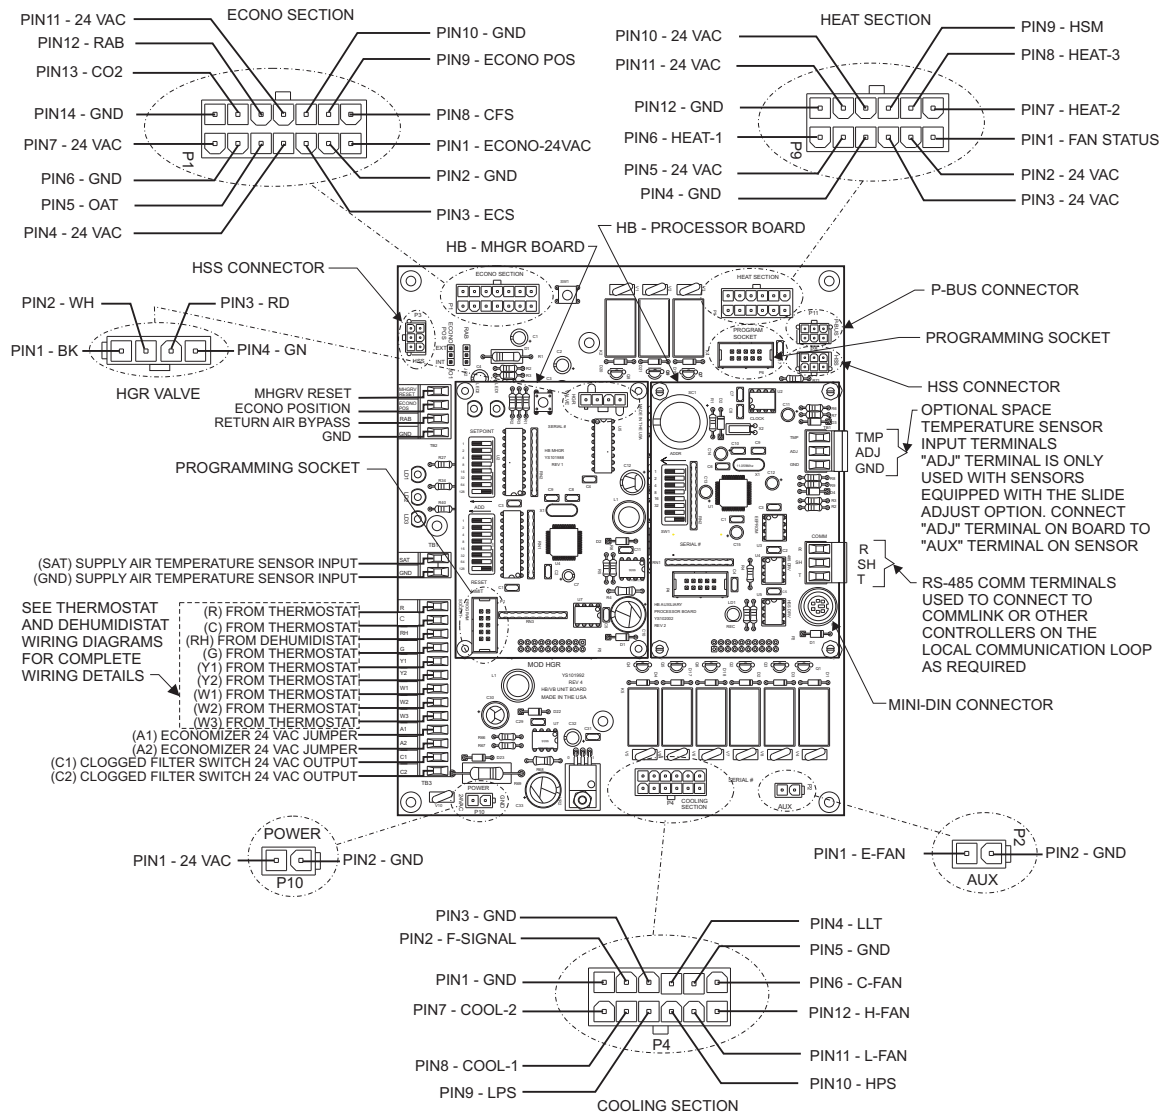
HB Controller Wiring (Shown with Optional MHGRV & HB Processor Boards Installed)
